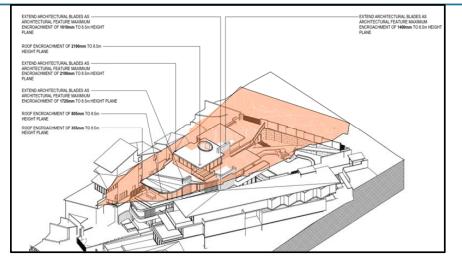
Building Height Plane diagram using existing ground level (RL3.8m AHD – floor level of lower ground floor level)
